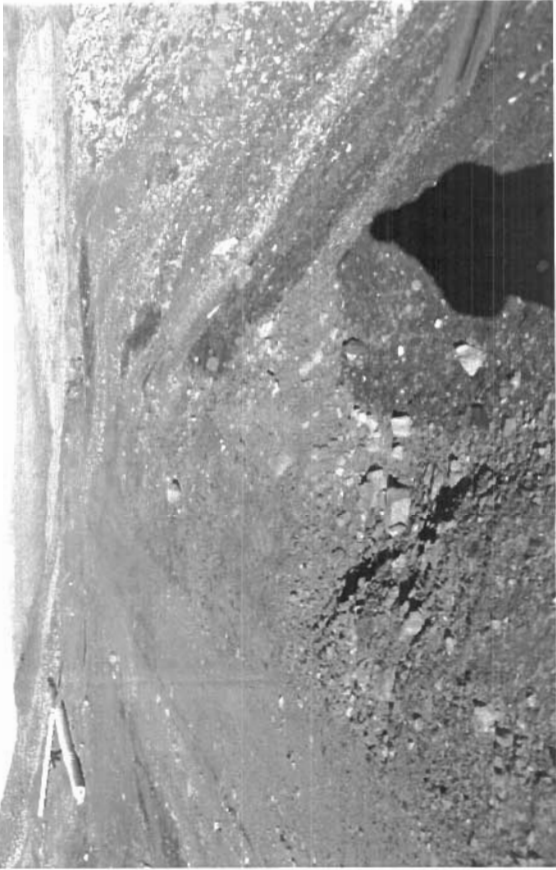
is a view of the fill placed at the north abutment as part of repairs taken following overtopping of this abutment.
